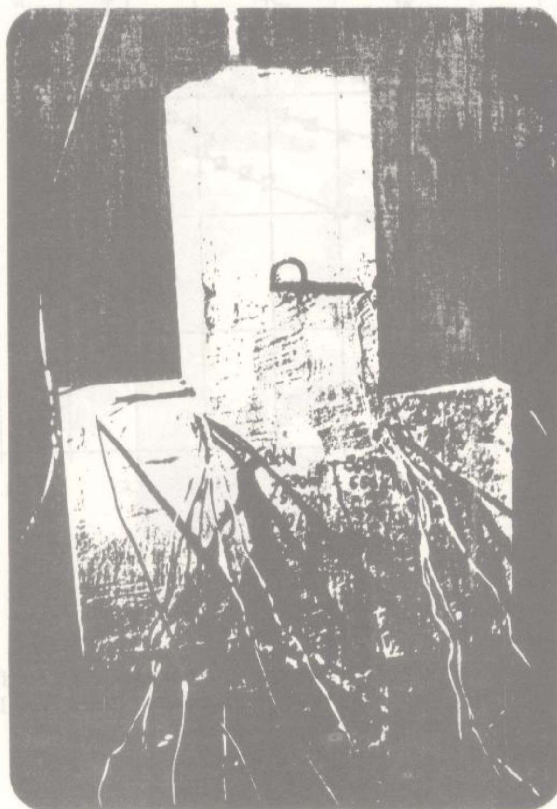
Cracks development for bracket type B combined loaded vertically and horizontally after failure.
